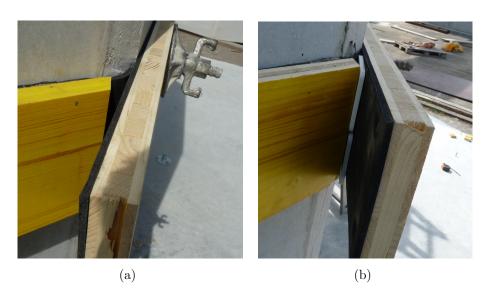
Sealing the outer edges of the formwork using (a) EPDM stripes and (b) plastic plates
